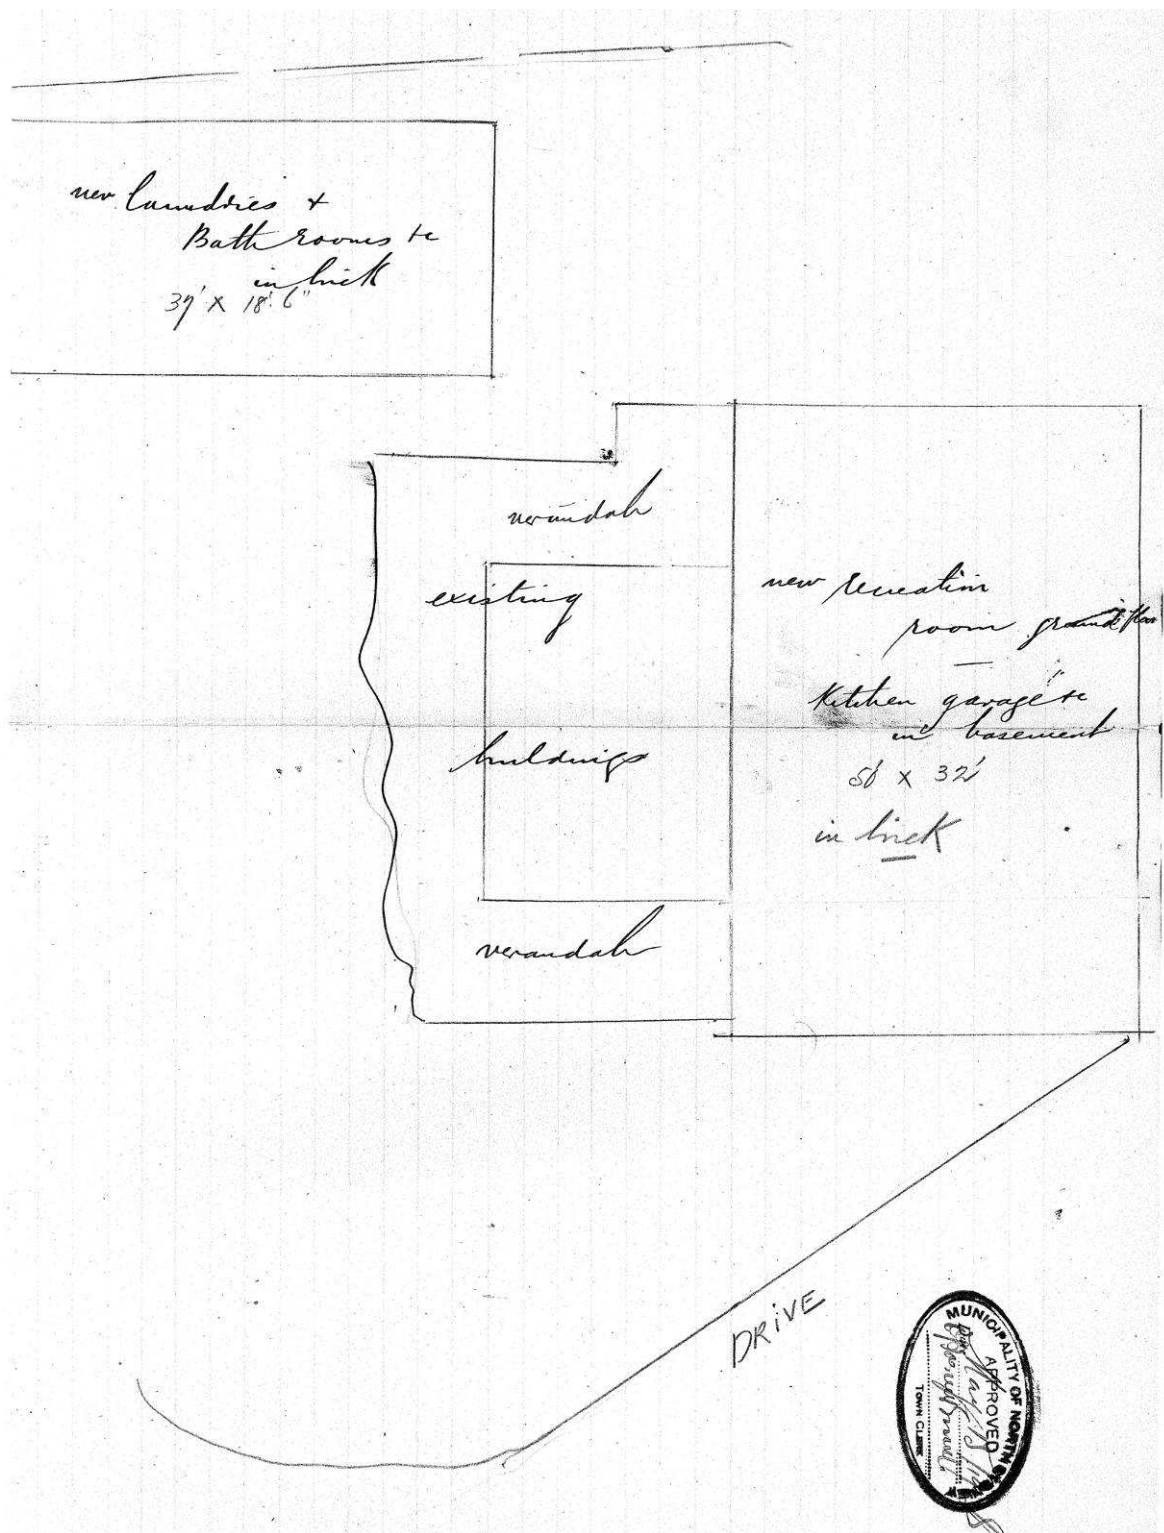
The recreation room and bathroom/lavatory block additions to the Hut were constructed in 1919. The building application was lodged in May 1919. The builder was James Leckie and the architect was Maurice Halligan.
